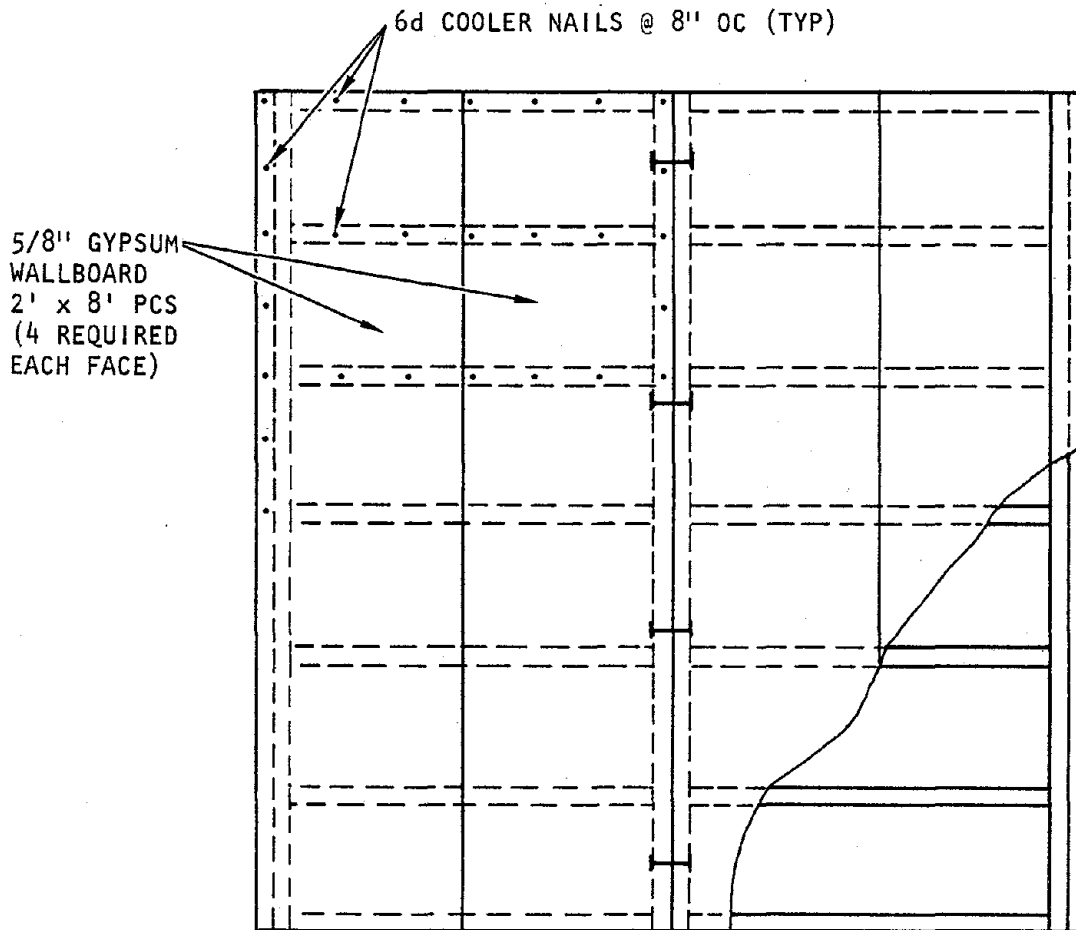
SPECIMEN A - GYPSUM WALLBOARD (HORIZONTAL JOINT)
